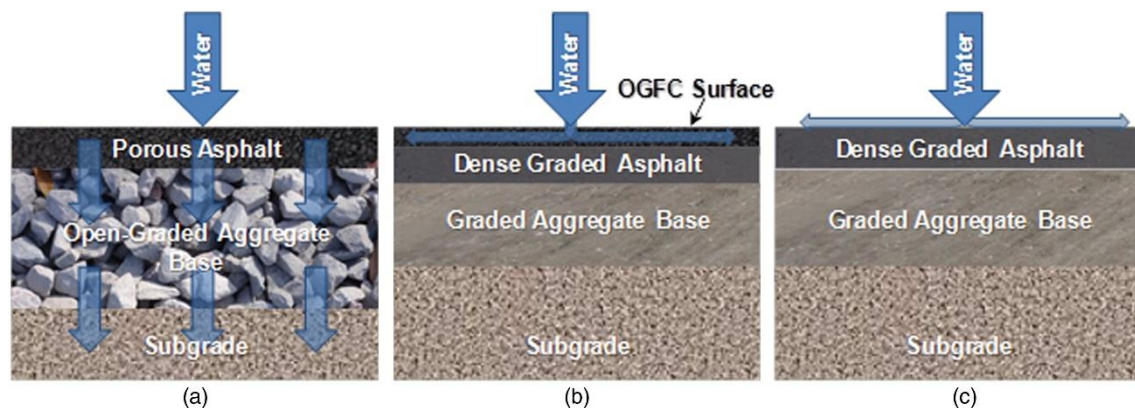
Typical Asphalt Pavement Sections (a) permeable asphalt pavement, (b) asphalt pavement with OGFC surface, and (c) conventional asphalt pavement (Putman and Kline 2012)
